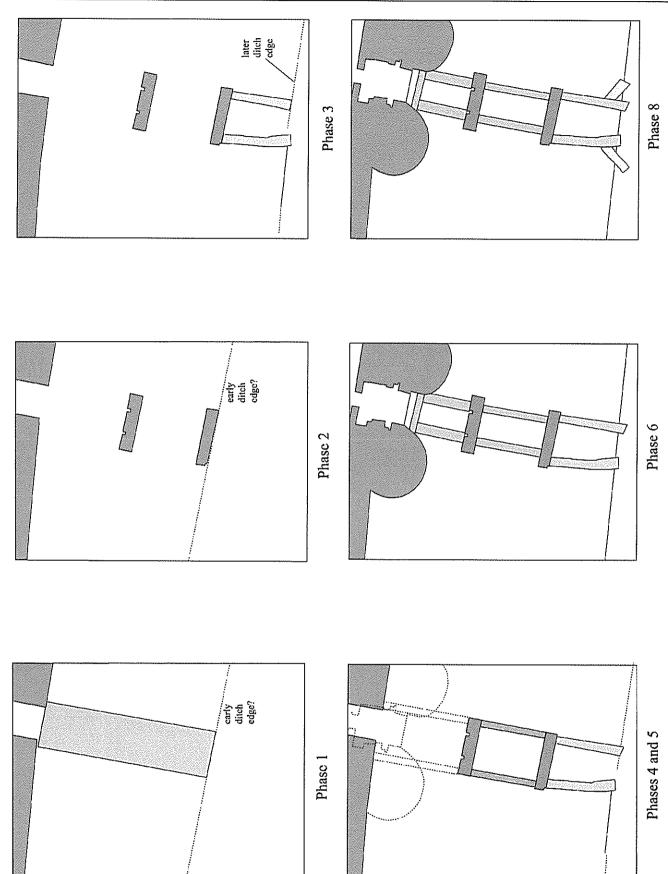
Proposed Phasing of bridge/causeway (Area E)
